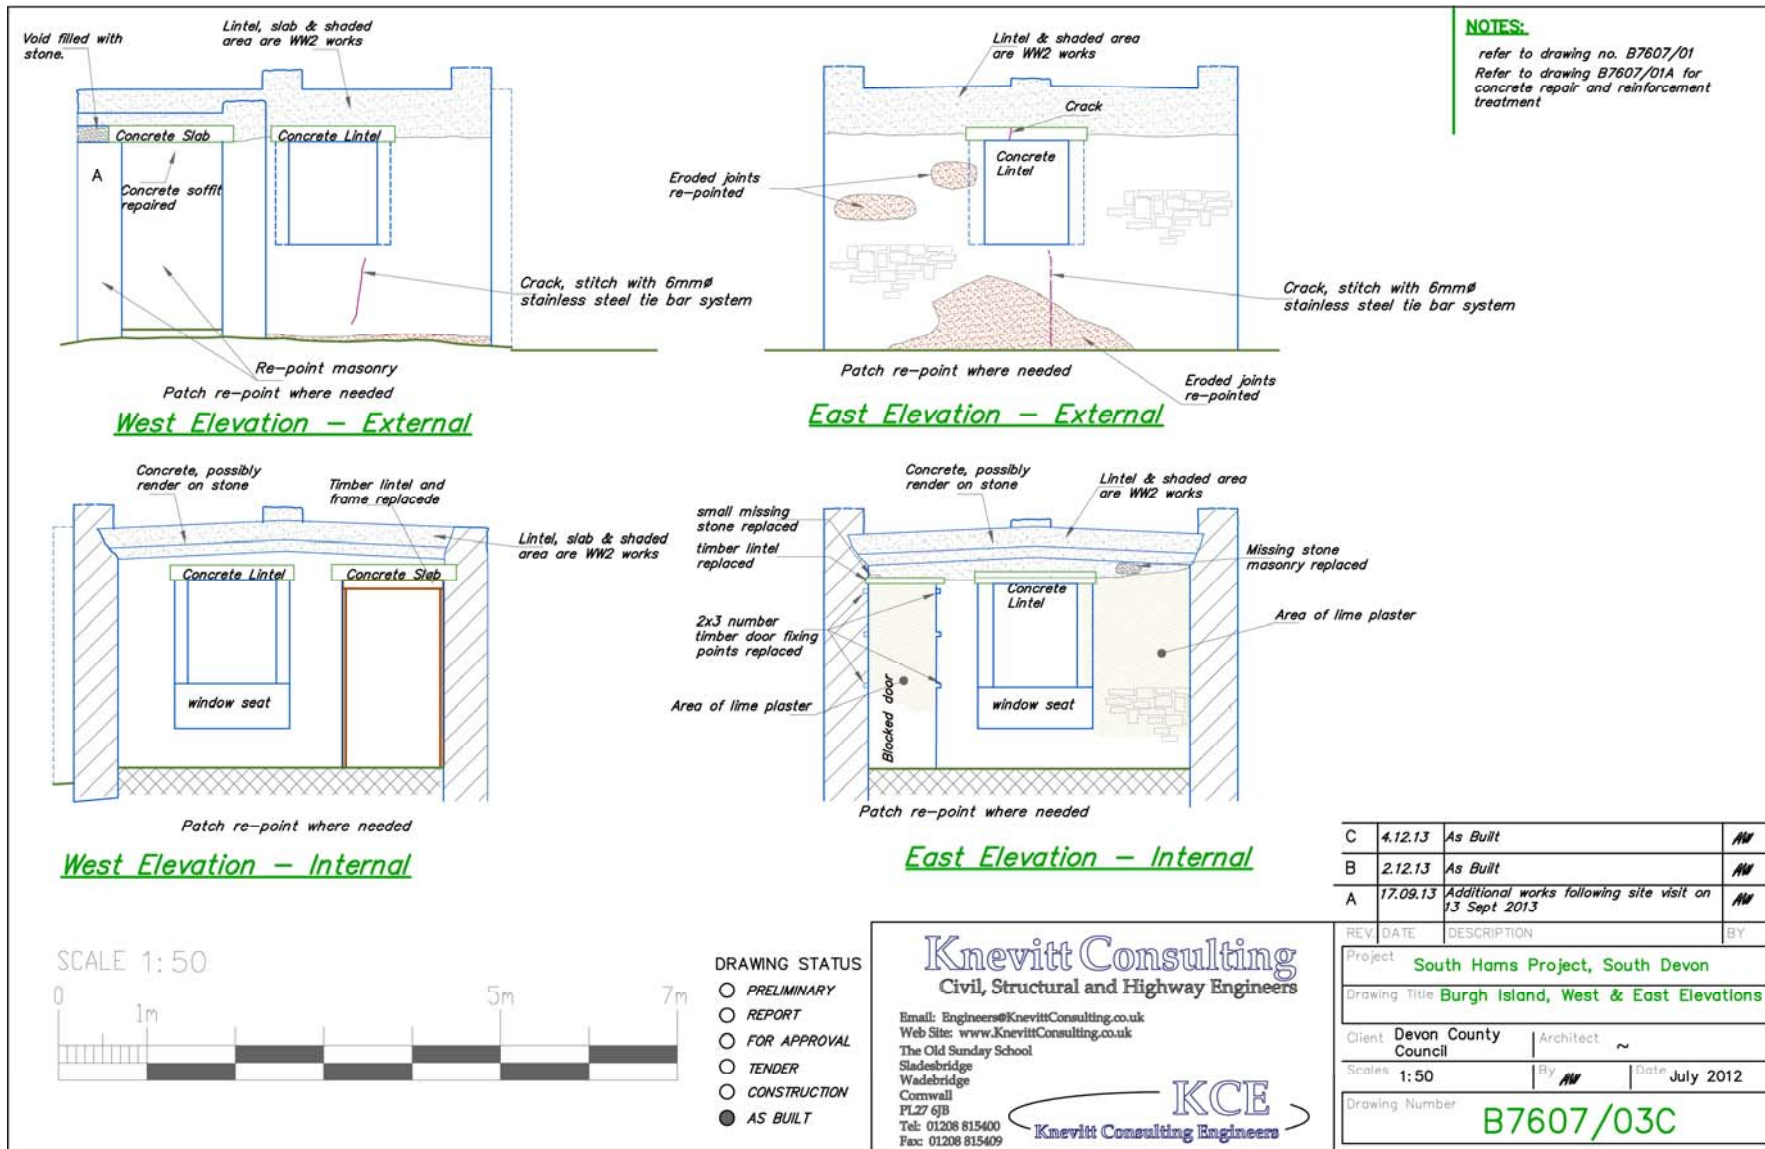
West and East elevational surveys (internal and external) of the Huer's observation building after works © Kneivitts 4/12/13.
